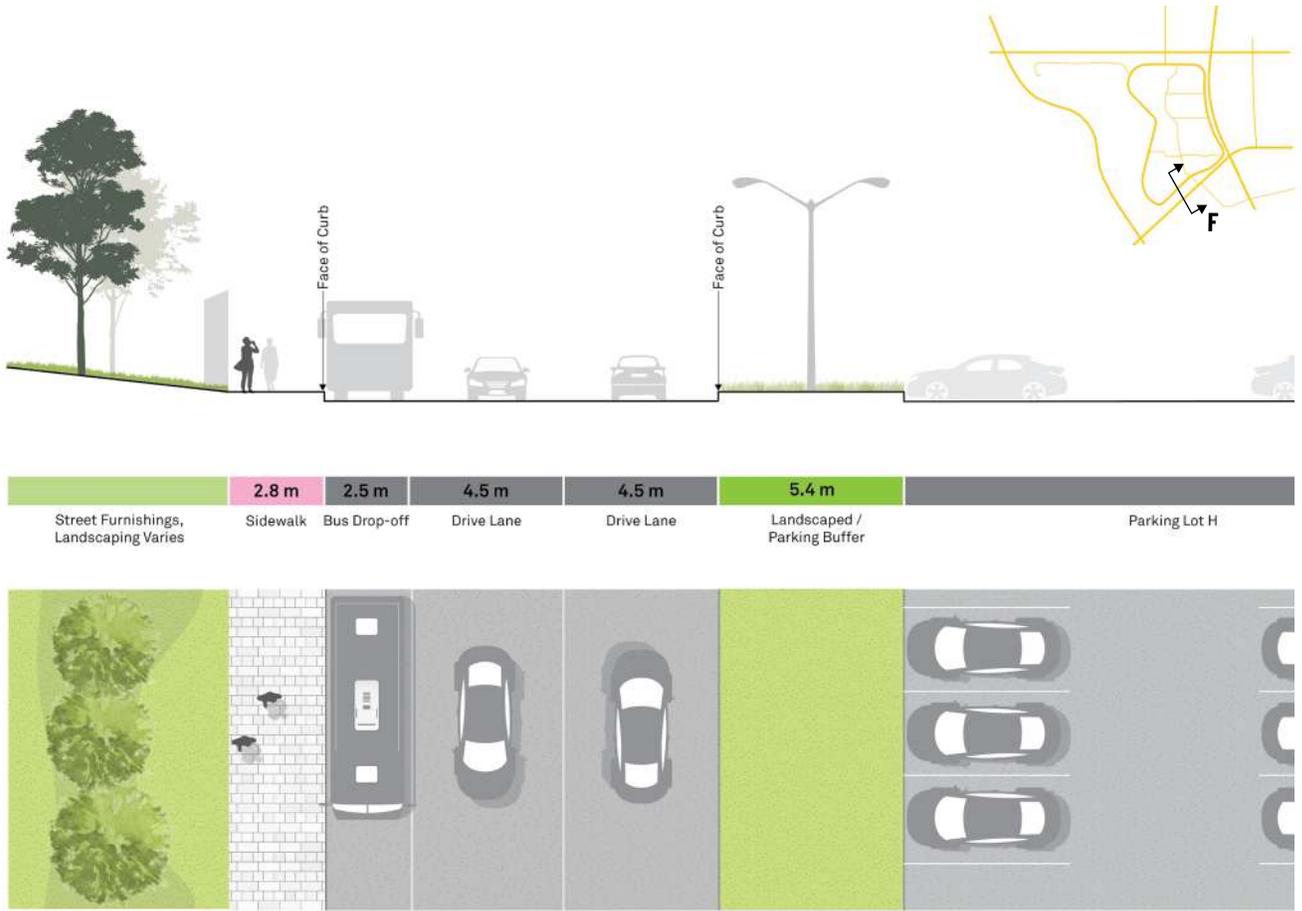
Section F. Existing condition of Ring Road (southern edge).
